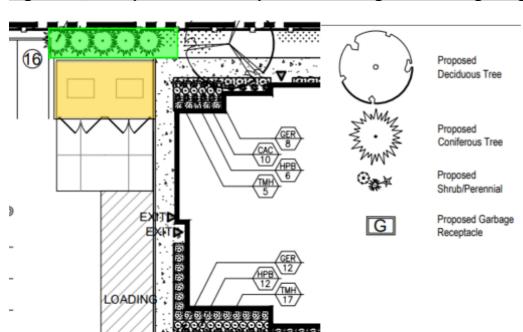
, Excerpt from Landscape Plan showing location of garbage enclosure.
